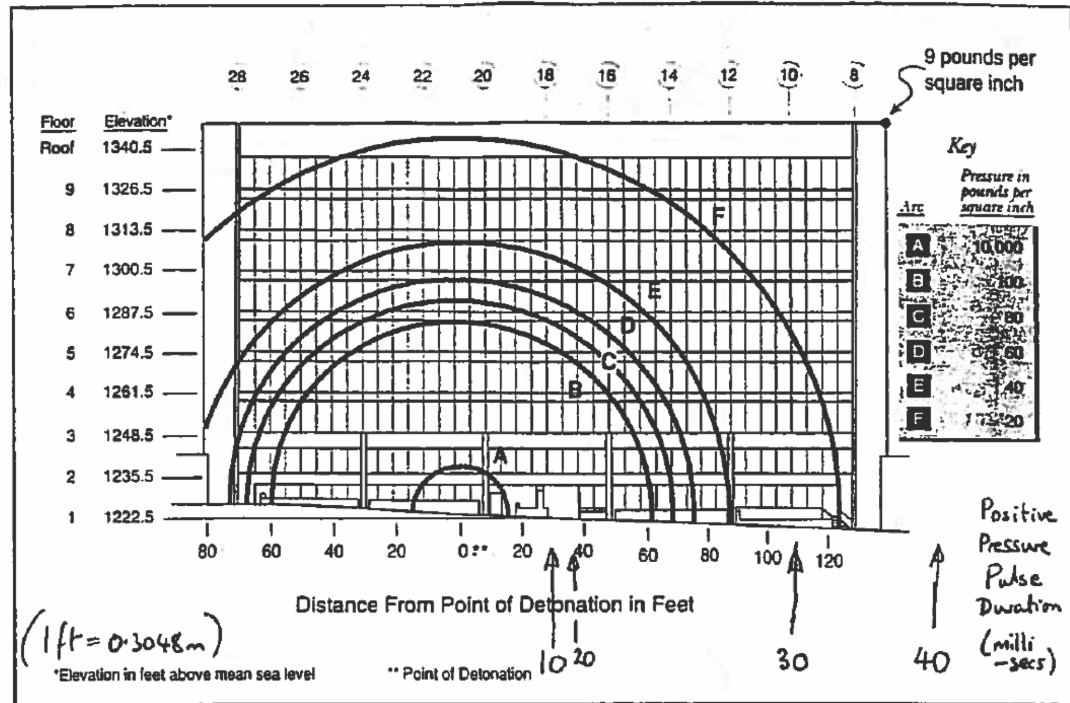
Peak overpressures on north elevation of nine-story portion of Murrah Building.
